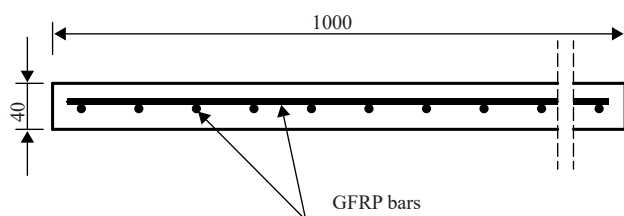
Cross-section of nonstructural stay-in-place formwork
